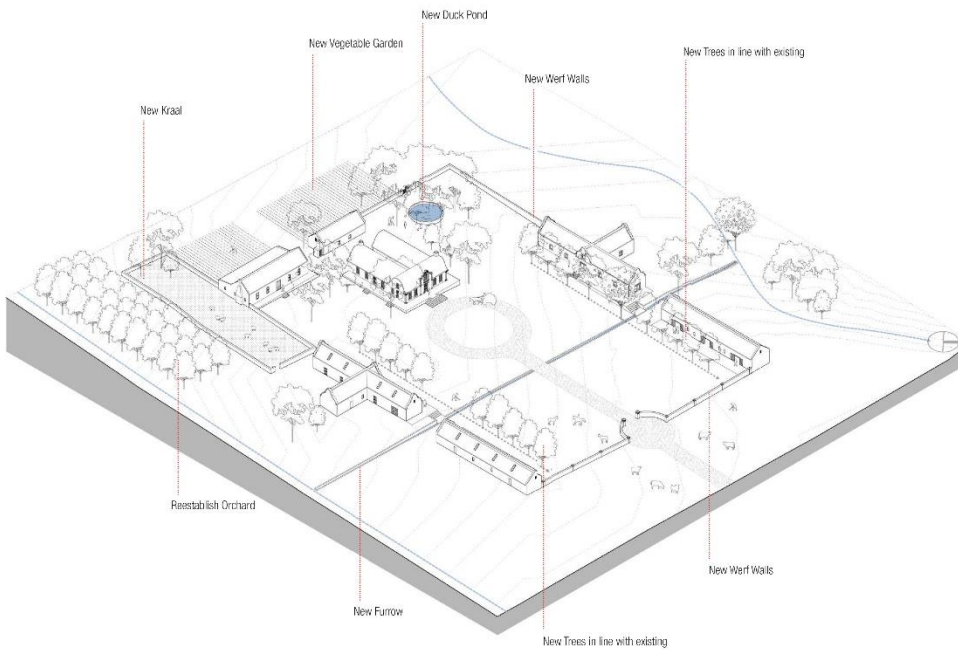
3D showing new buildings, additional werf walls and landscape elements
